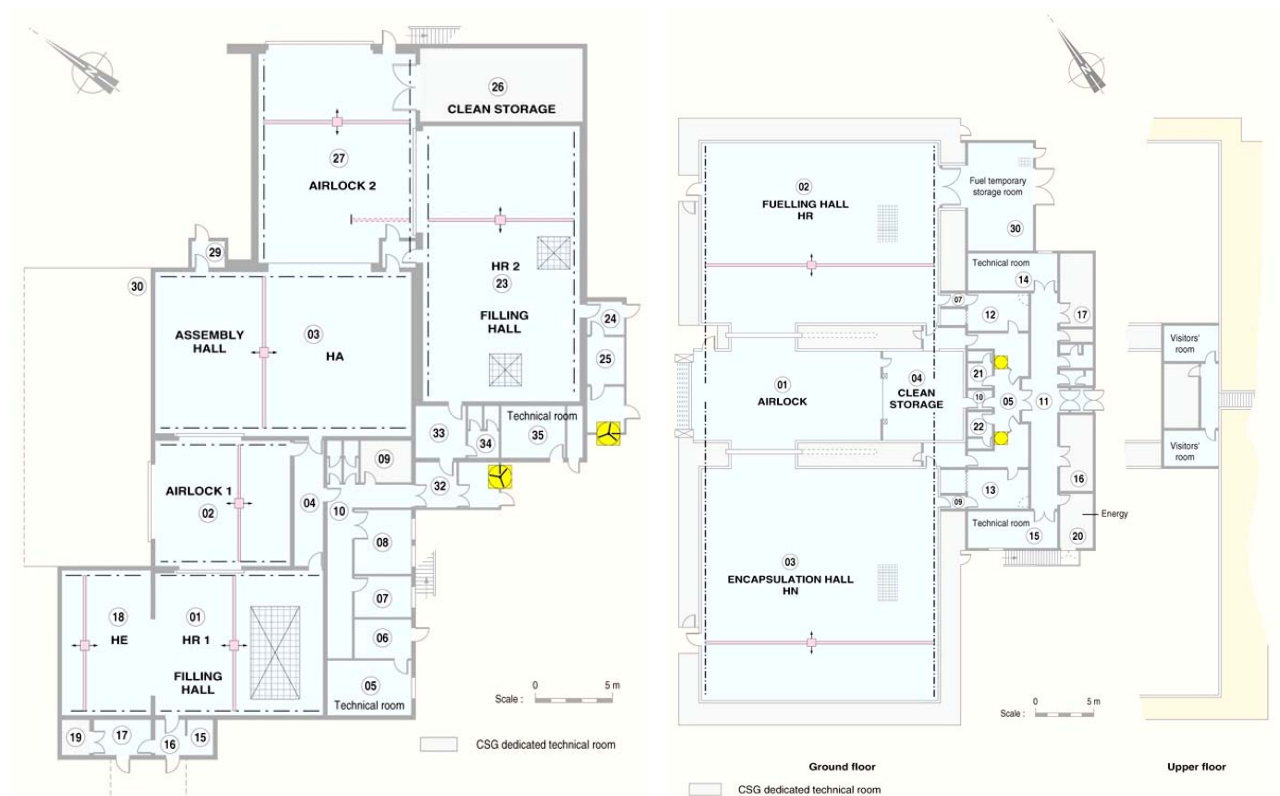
c – Layout of hazardous at S3 area (S3A and S3B)
